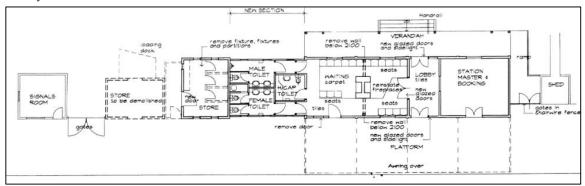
The Station building floorplan. Showing changes approved 1994, including the removal of the wall to the waiting room and reconfiguration of the bathroom area.
